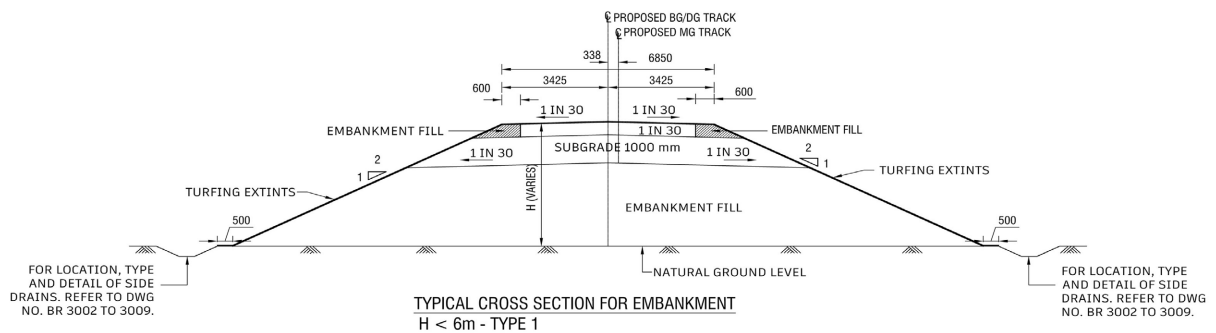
Typical cross section for embankment height less than 6 m (Type 1).
